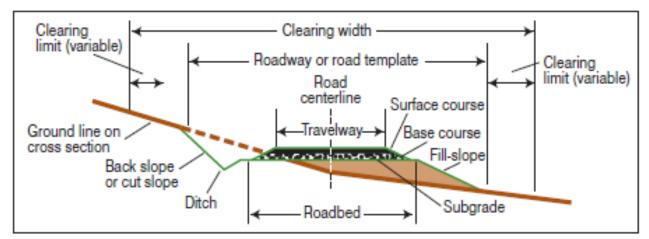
Road element nomenclature. Source: Brian Kramer
